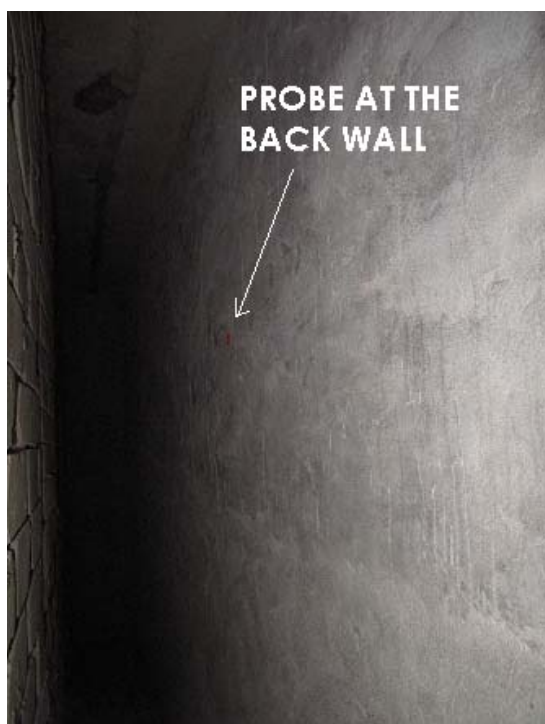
, Test Probe 7 – Installed at the back of block wall located at Battery Room 2
